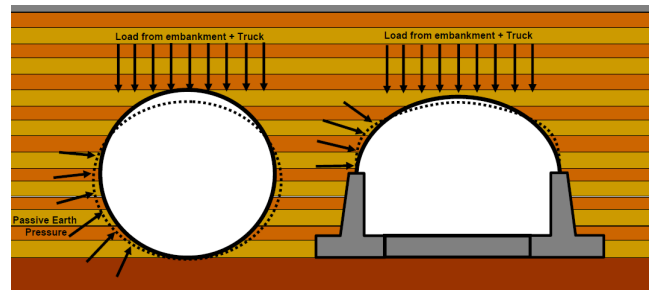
Typical deformation shapes of buried corrugated steel shell structures
